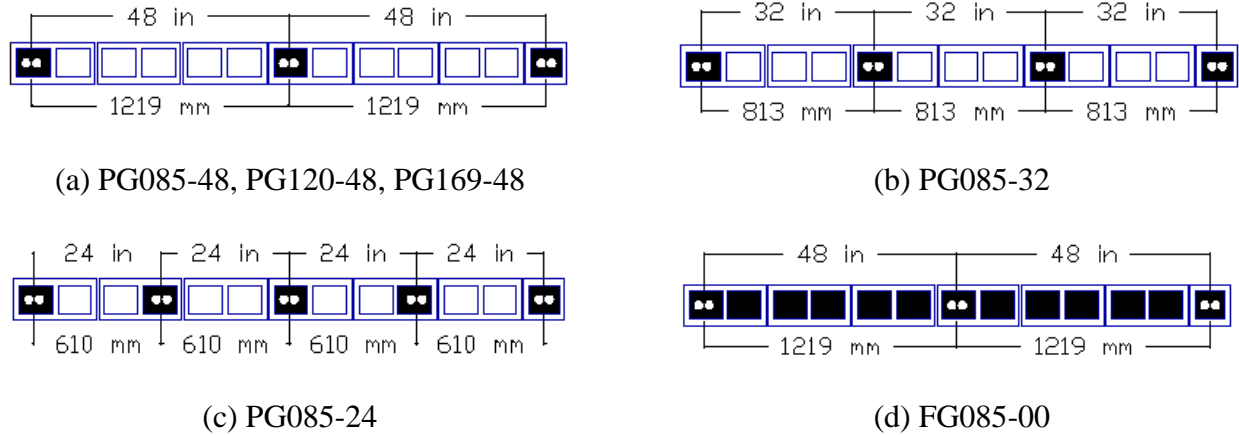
Horizontal cross-sections of wall specimens. Dimensions are center-to-center of the flexural (vertical) reinforcement. Grouted cells are indicated with shading. Specimen (a) PG085-48, PG120-48, PG169-48, (b) PG085-32, (c) PG085-24, and (d) FG085-00.
